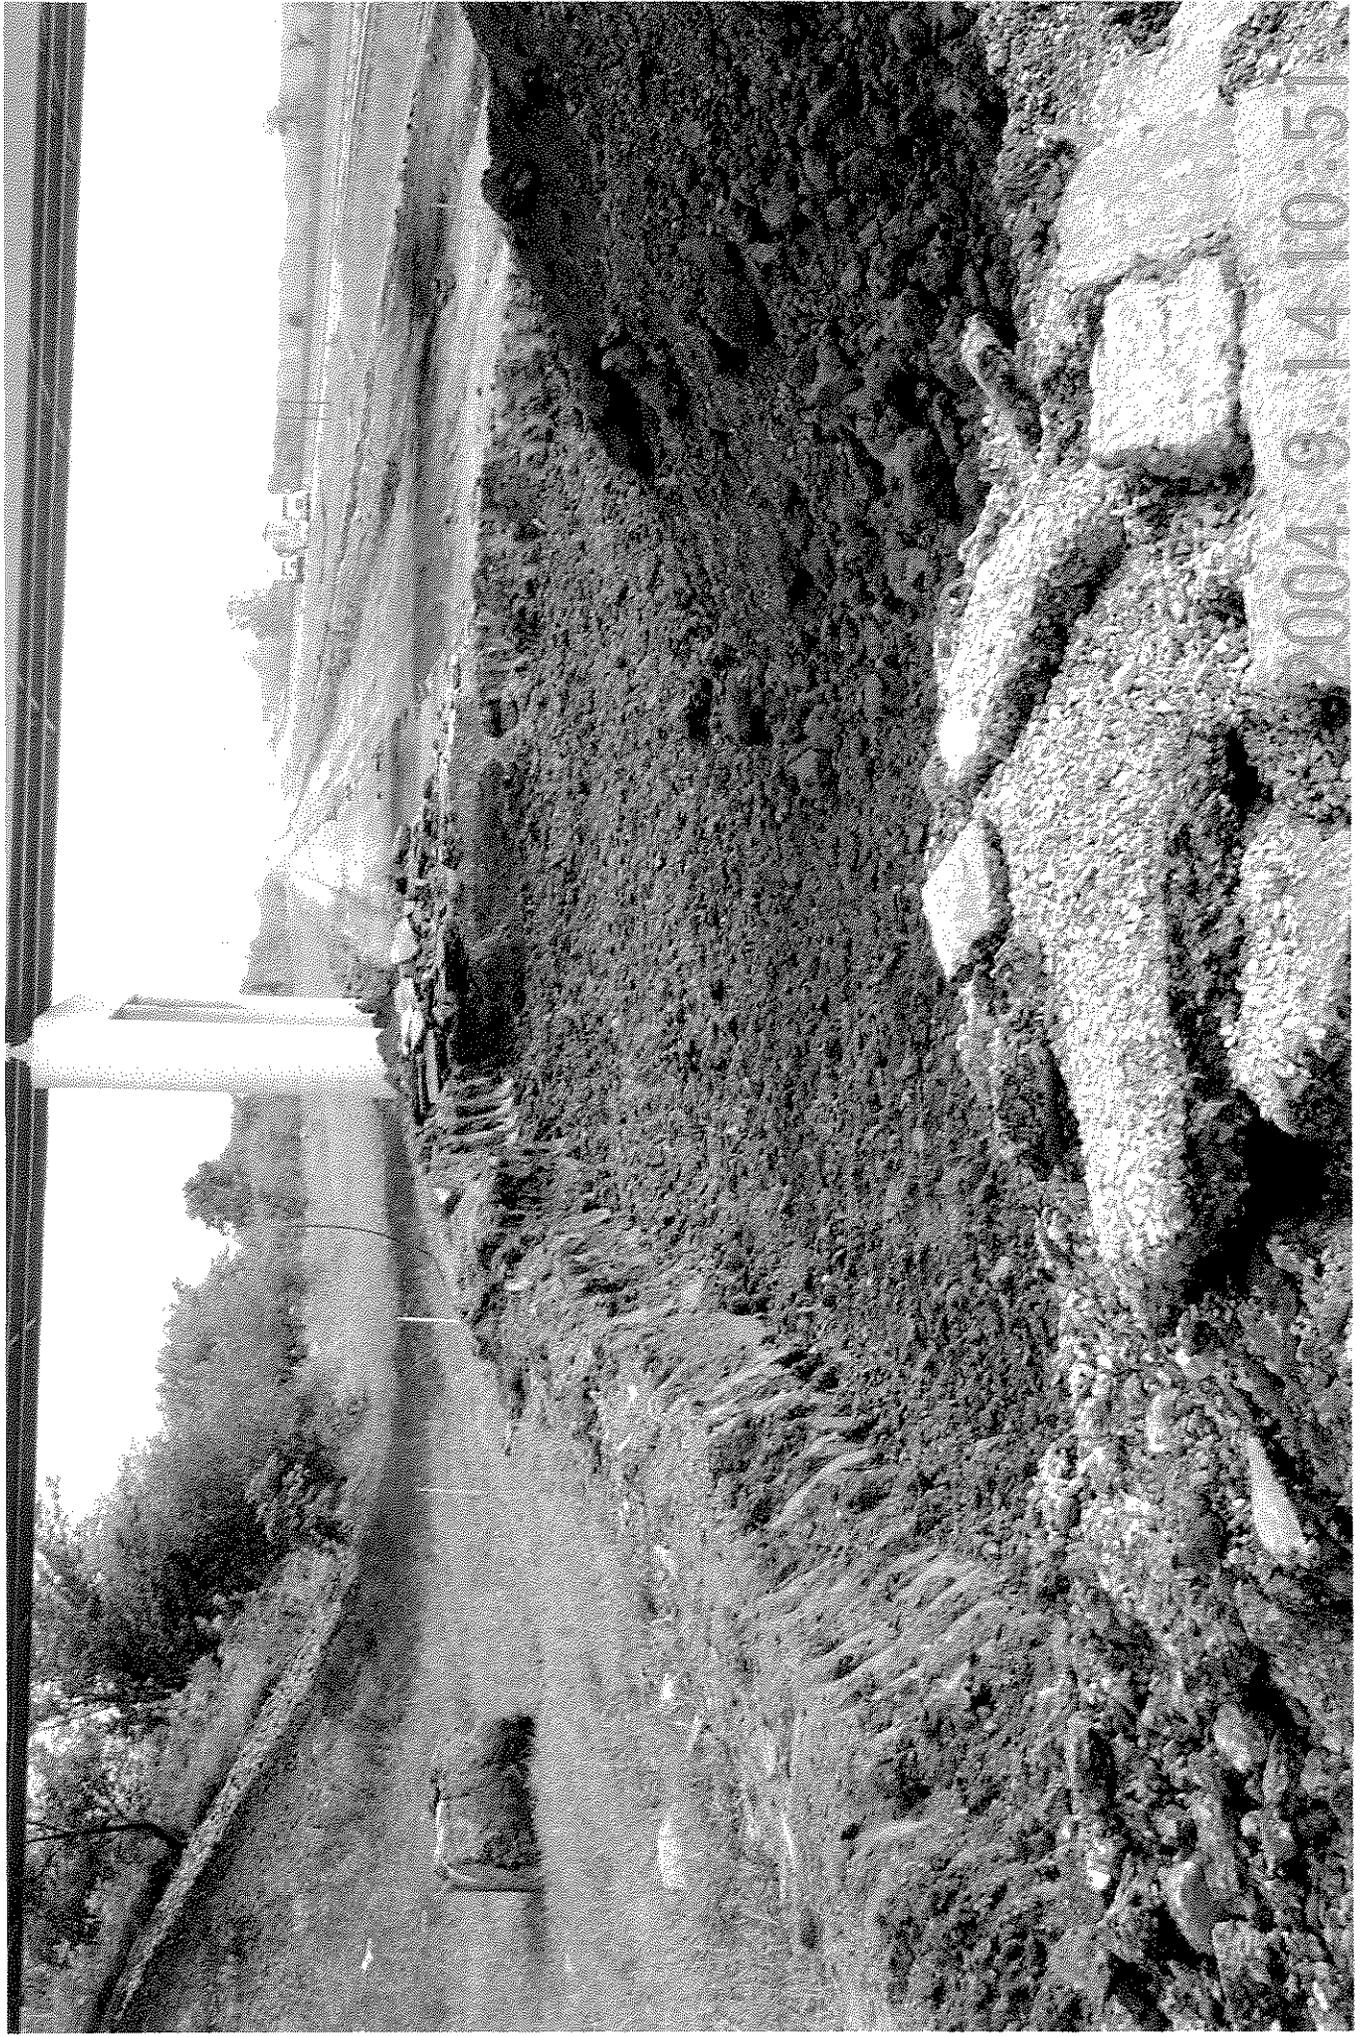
ODOT EXCAVATION@SPILL SITE
